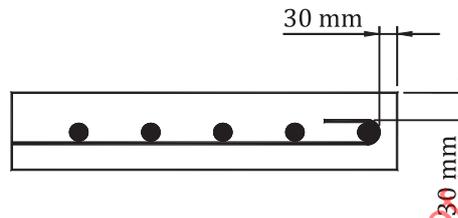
All types of reinforcement of solid slabs, structural concrete walls or joists, when not exposed to weather or in contact with ground (Minimum concrete cover: 30 mm)
